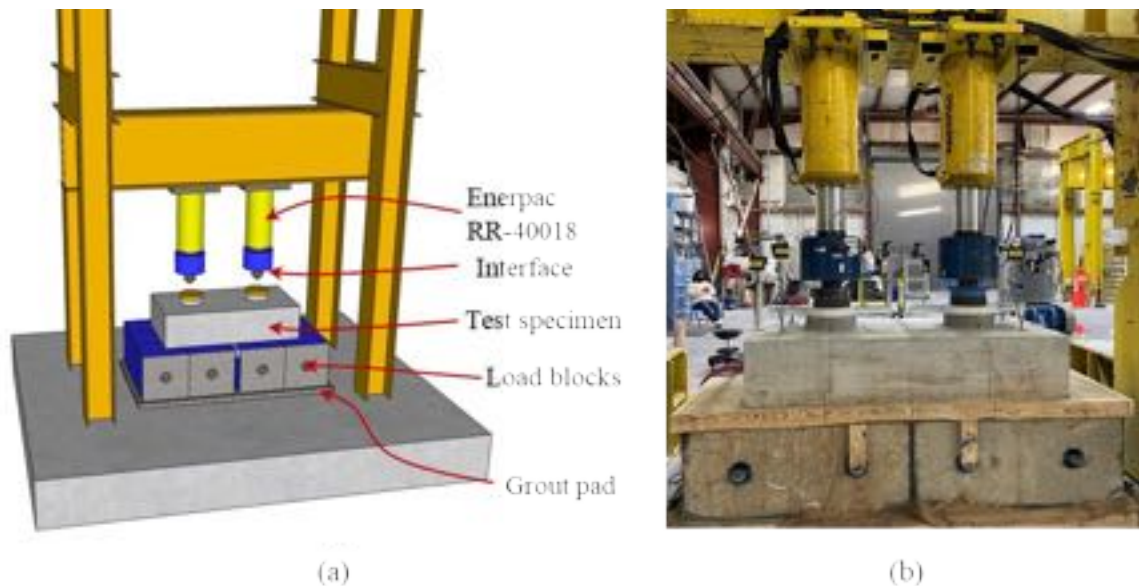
(a) Schematic and (b) photograph of test setup for multi-plug specimens.
